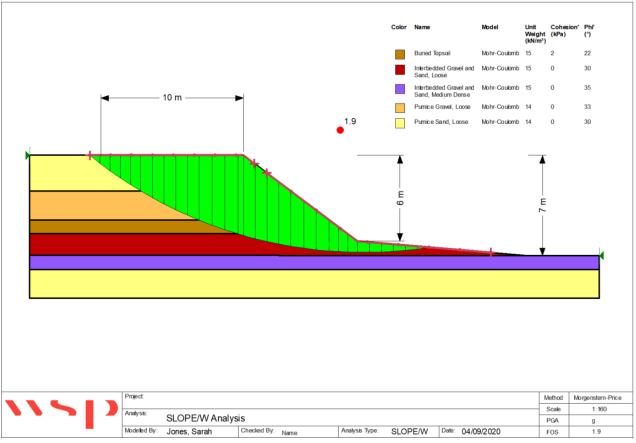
Slope Stability Model at Brentwood Gully Extension, static, failure 10m back from slope edge
